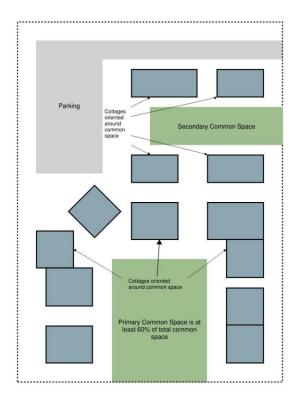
(H)(4)(c): Cottage Open Space Sample Layout
